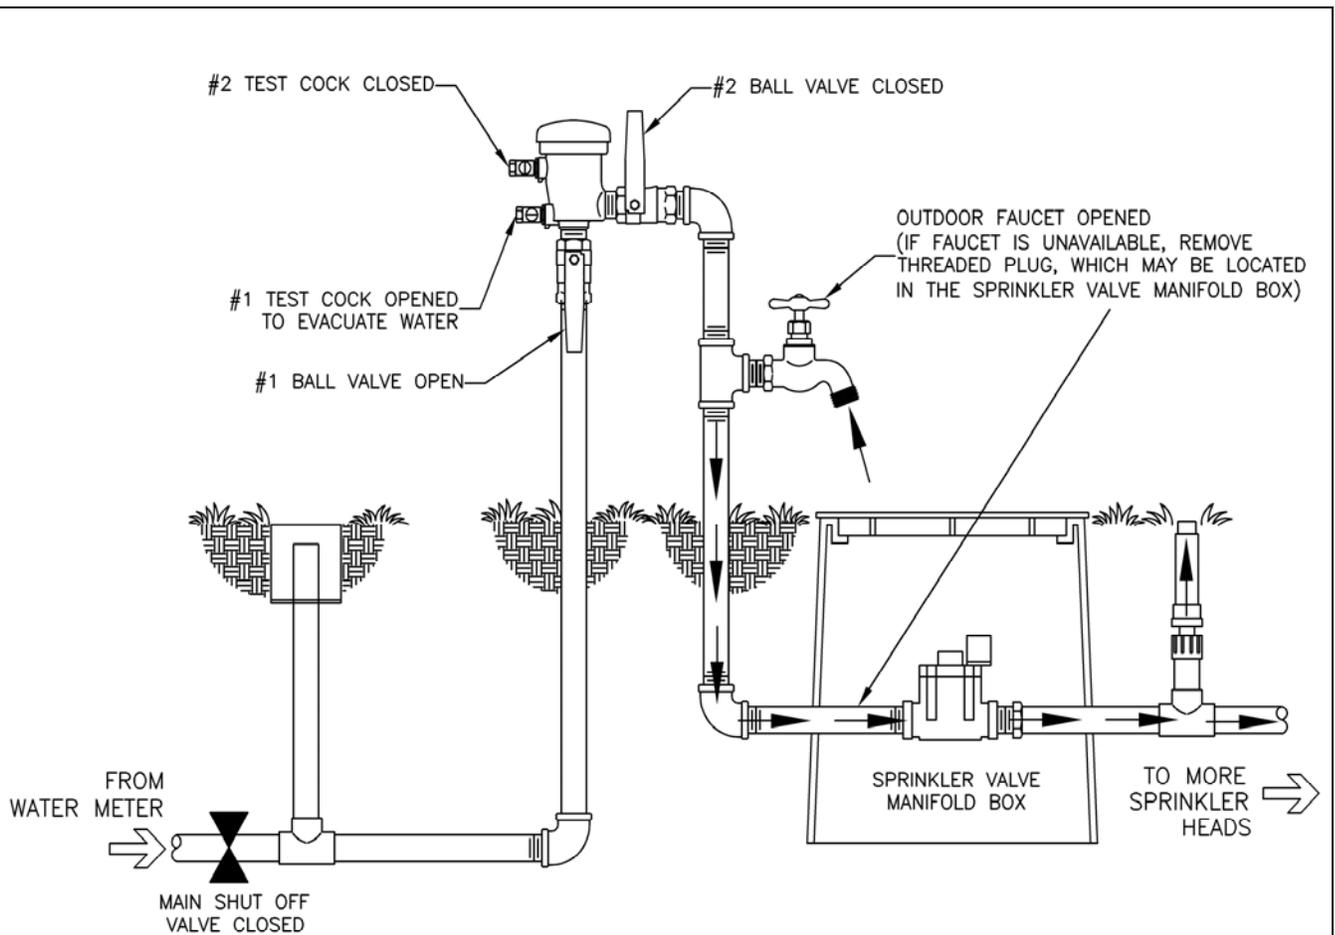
A. Winterizing Pressure Vacuum Breaker Assembly Using Air Compressor
